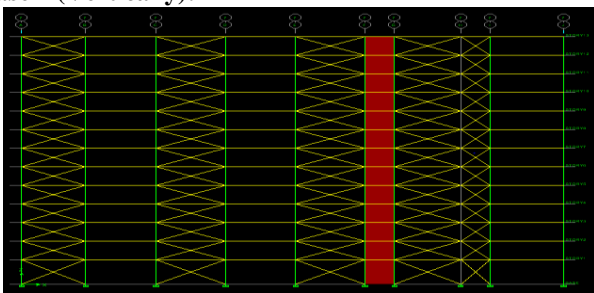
Elevation view of building with alternate bracings. (Vertically from 1bay)
